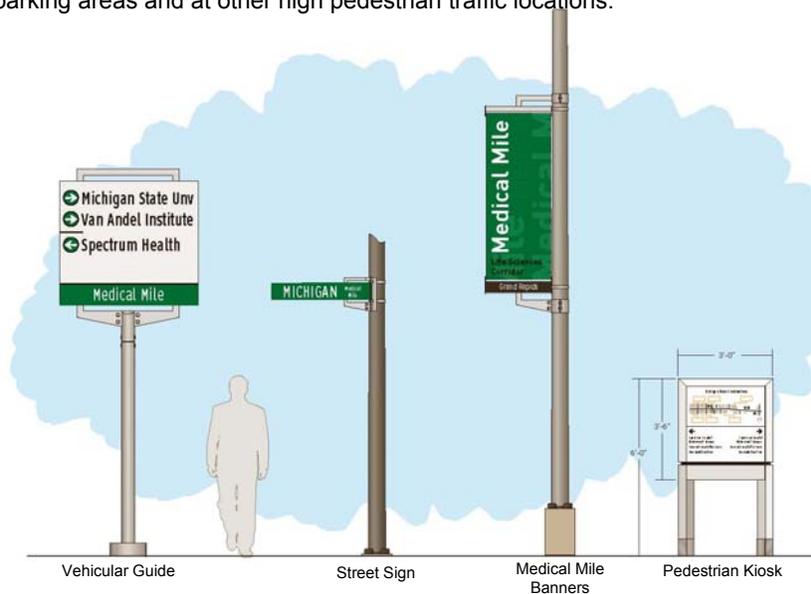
Michigan Street Wayfinding Sign Concept: Public Elements
